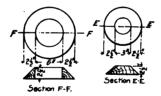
Forms for Constructing Openings for the Entrance of Circular Ducts Into Concrete Vaults.
